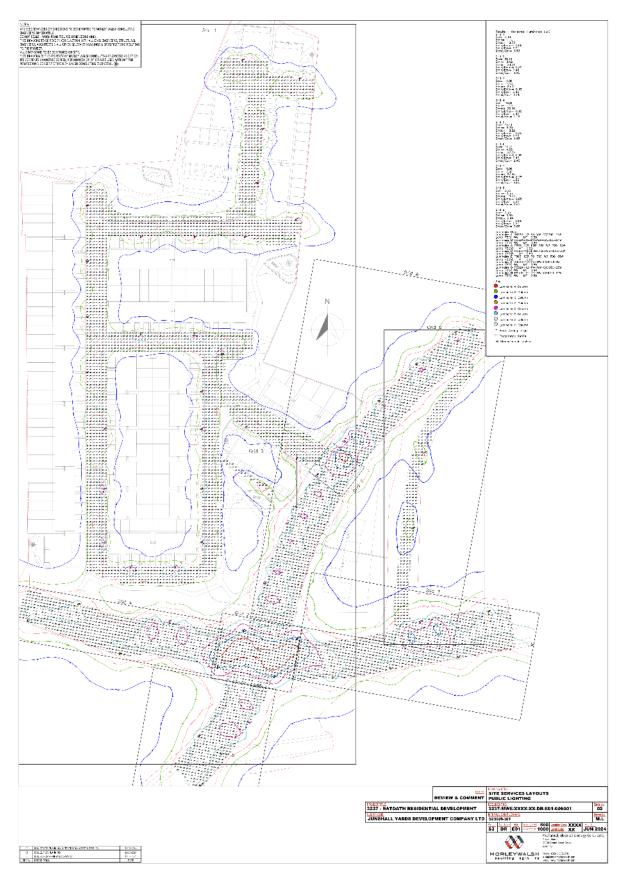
PROPOSED LIGHTING PLAN AND LUX LEVELS (MORLEY WALSH, 2024B).
